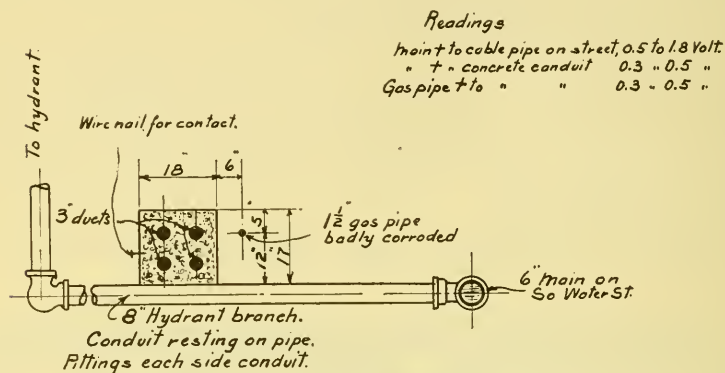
EXCAVATION AT SOUTH WATER AND SILVER STREETS, PROVIDENCE, R. I., NOV. 23, 1908, SHOWING POSITIONS OF TELEPHONE CONDUIT AND WATER MAIN.
